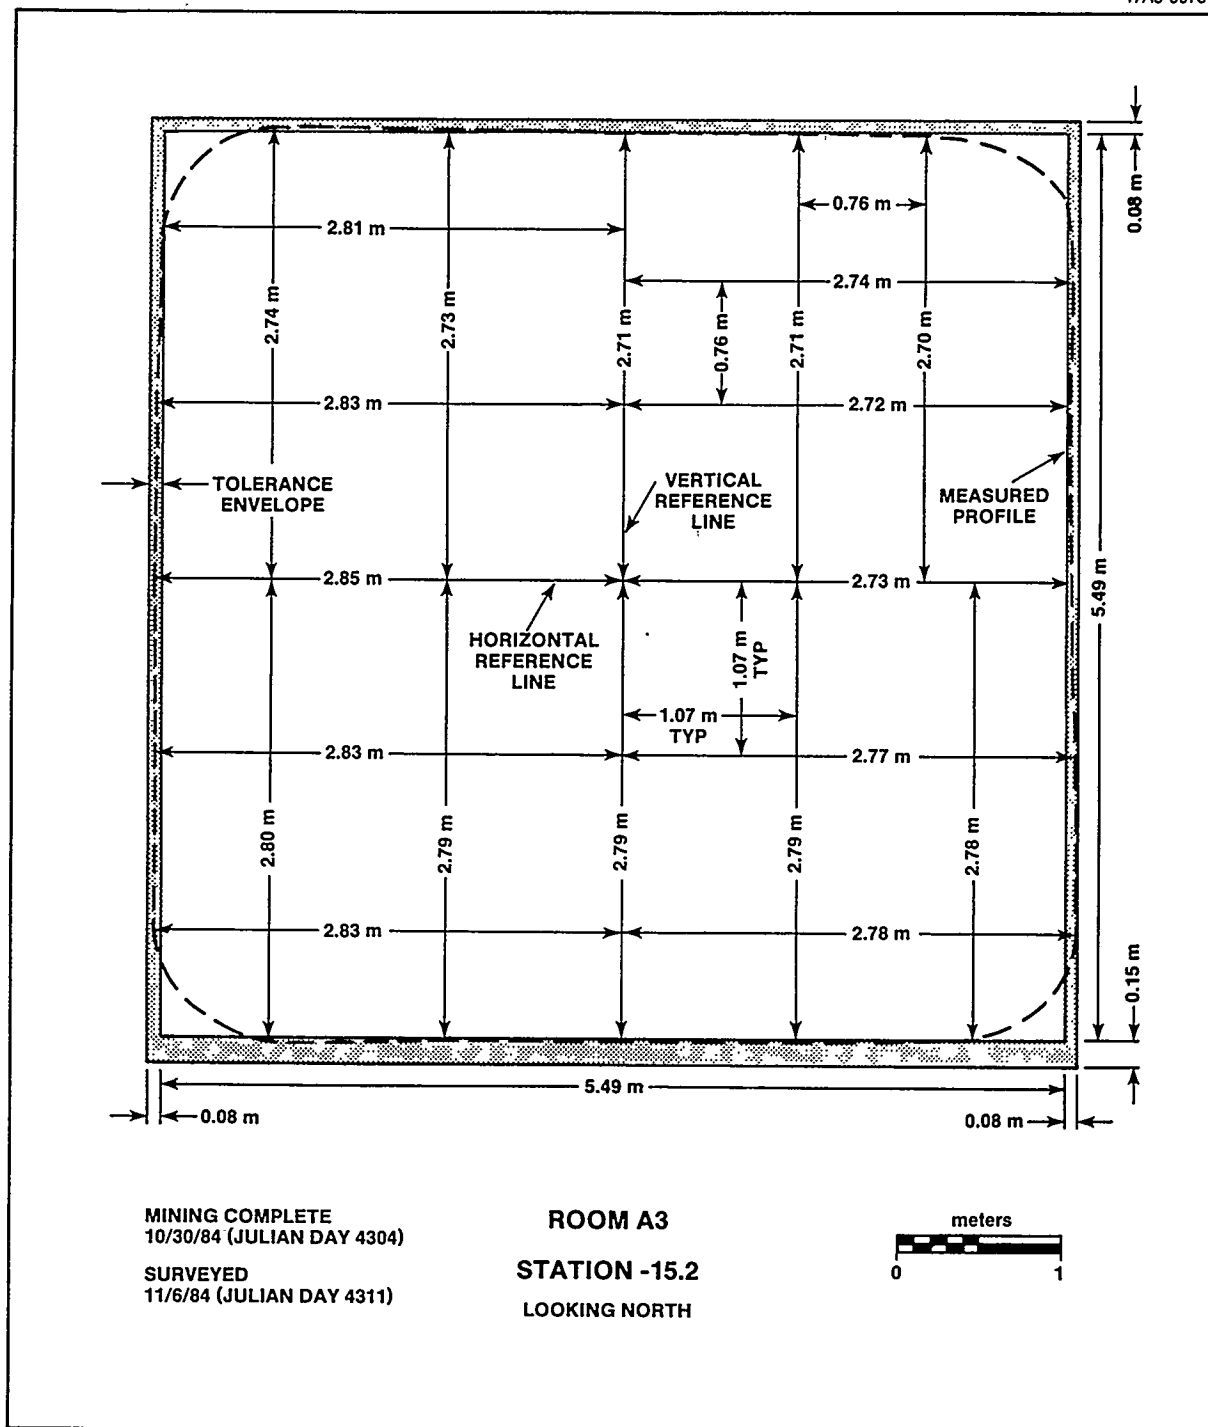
As-Built Cross Section of Station -15.2 m, Room A3
